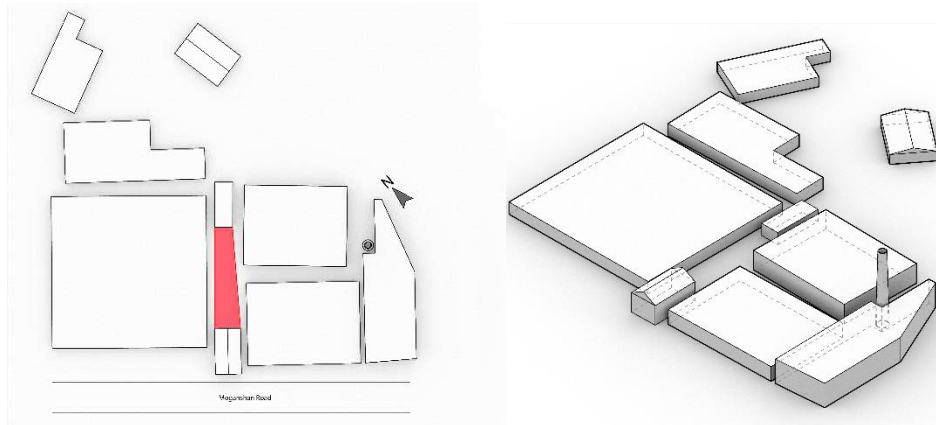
Building Site Top View (left) and Axonometry (Right) (author)
